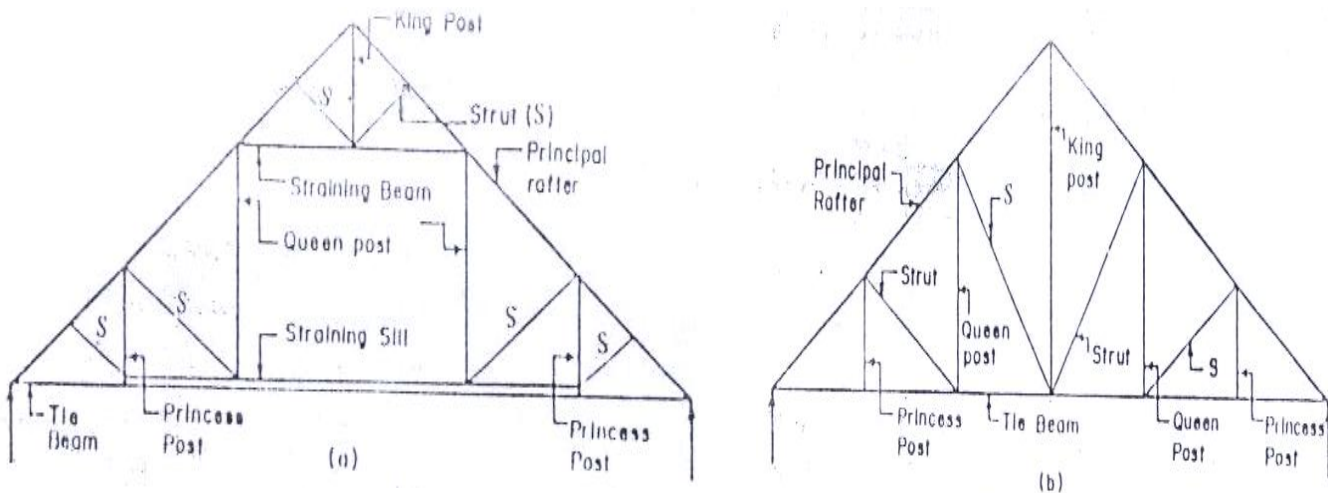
Combination of king-post truss and queen-post trusses
